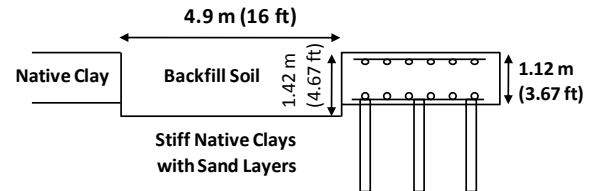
Profile view of the South Temple [5.18 m (17 ft) wide cap] test configuration.
